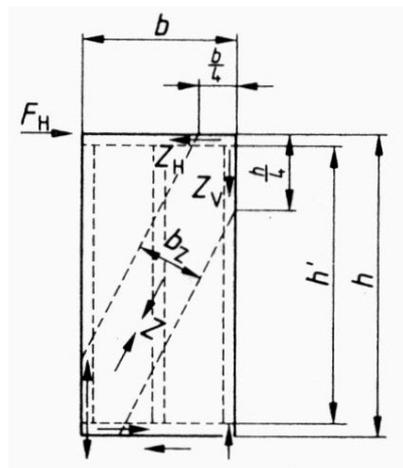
Wall panel with sheathing on one side. The transfer of the tension force  $Z$  in the sheathing (Source: DIN 1052)
